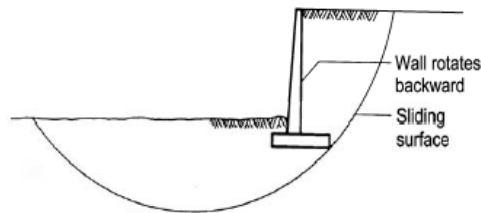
Retaining Wall Overall Stability Failure
